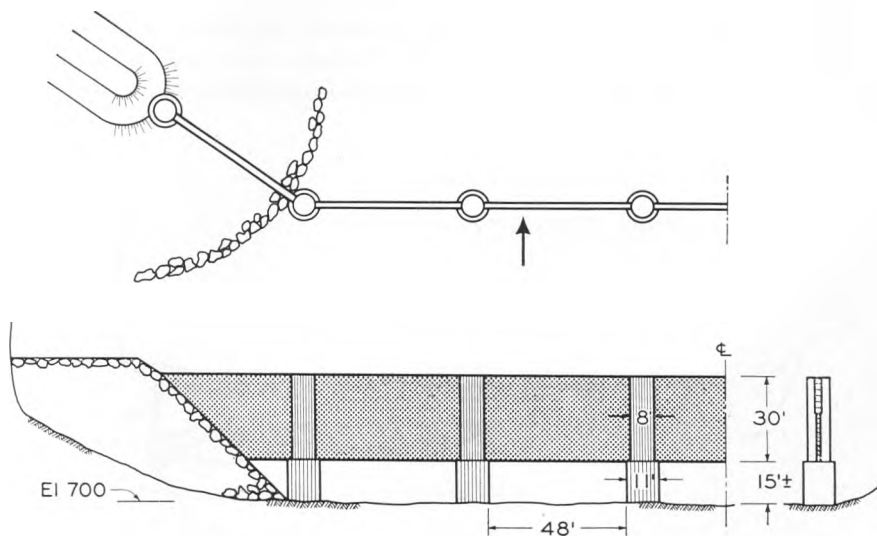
KINGSTON SKIMMER WALL--HALF PLAN AND ELEVATION.
